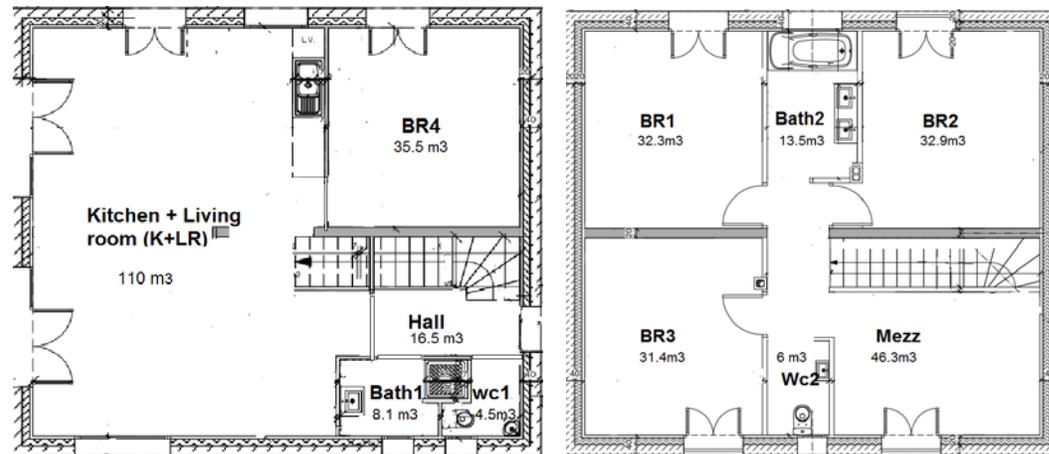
Plan of the house studied: (a) ground floor (b) first floor.
